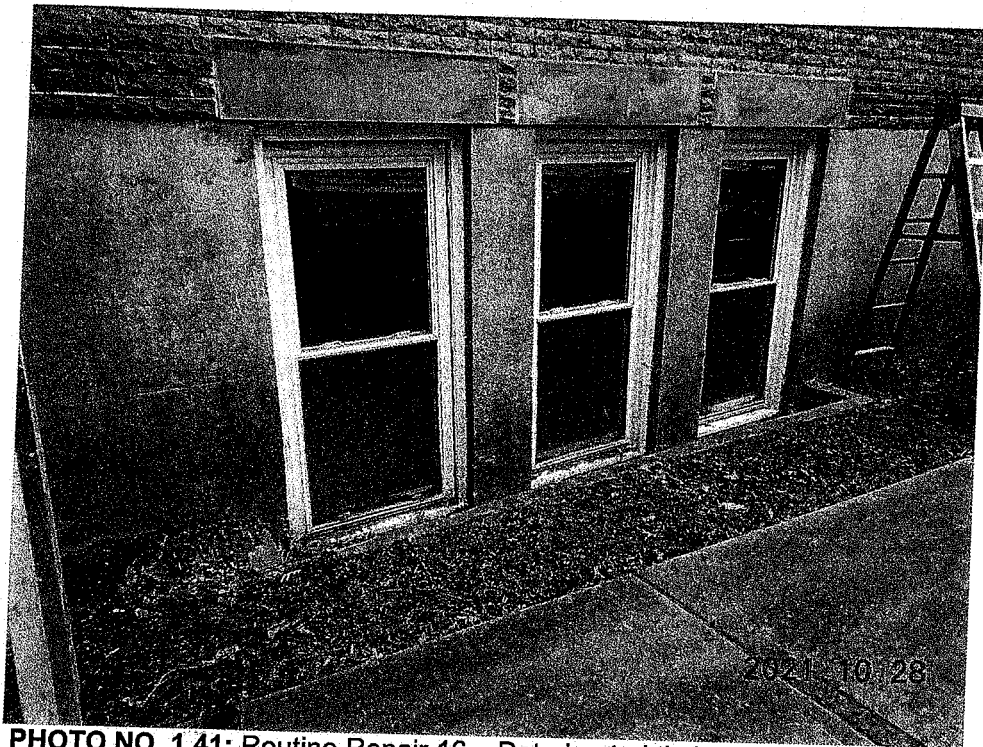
Routine Repair 16 – Deteriorated timber window frames due to sills being located below grade – East Elevation, Grid D: Ht. 2' +/-
